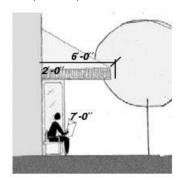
(E): Examples of encroachments into the sidewalk.
